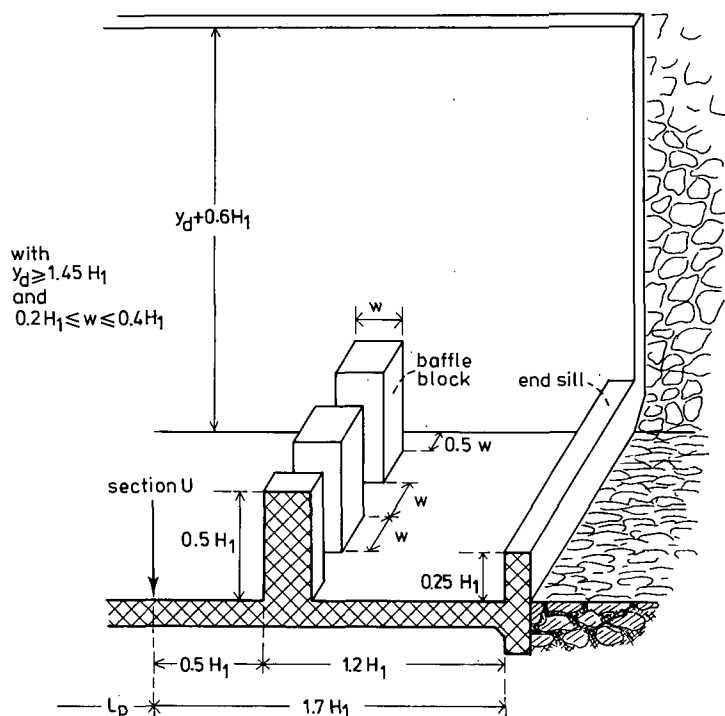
Section over center line of the baffle block type basin downstream from section U (Donnelly and Blaisdell 1954)
